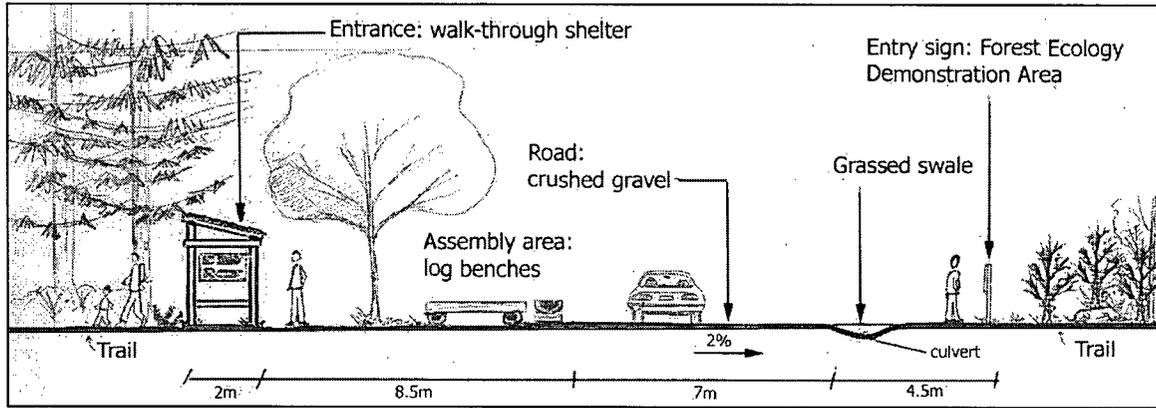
6 Site Entrance North Elevation. Scale 1:200
